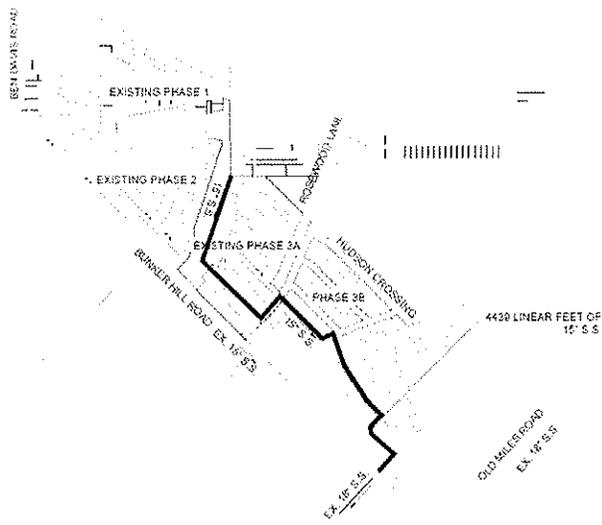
EXHIBIT "C" WASTEWATER SYSTEM FACILITIES
